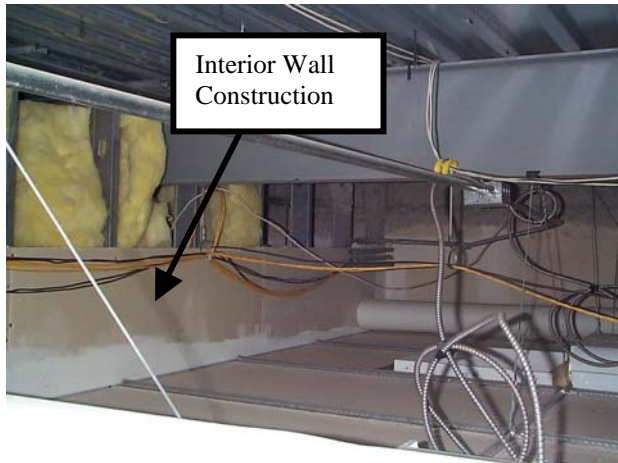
Floor, Wall, and Roof Section for Second Floor
